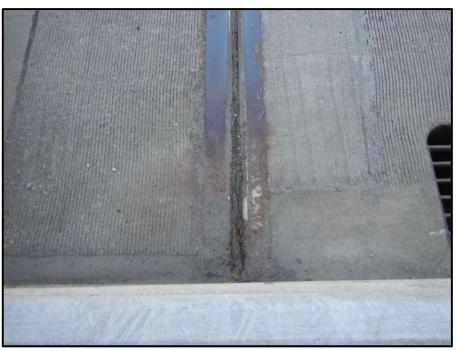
Looking west at east end of rear abutment strip seal joint. Note: typical corrosion and minor section loss to joint armor.
